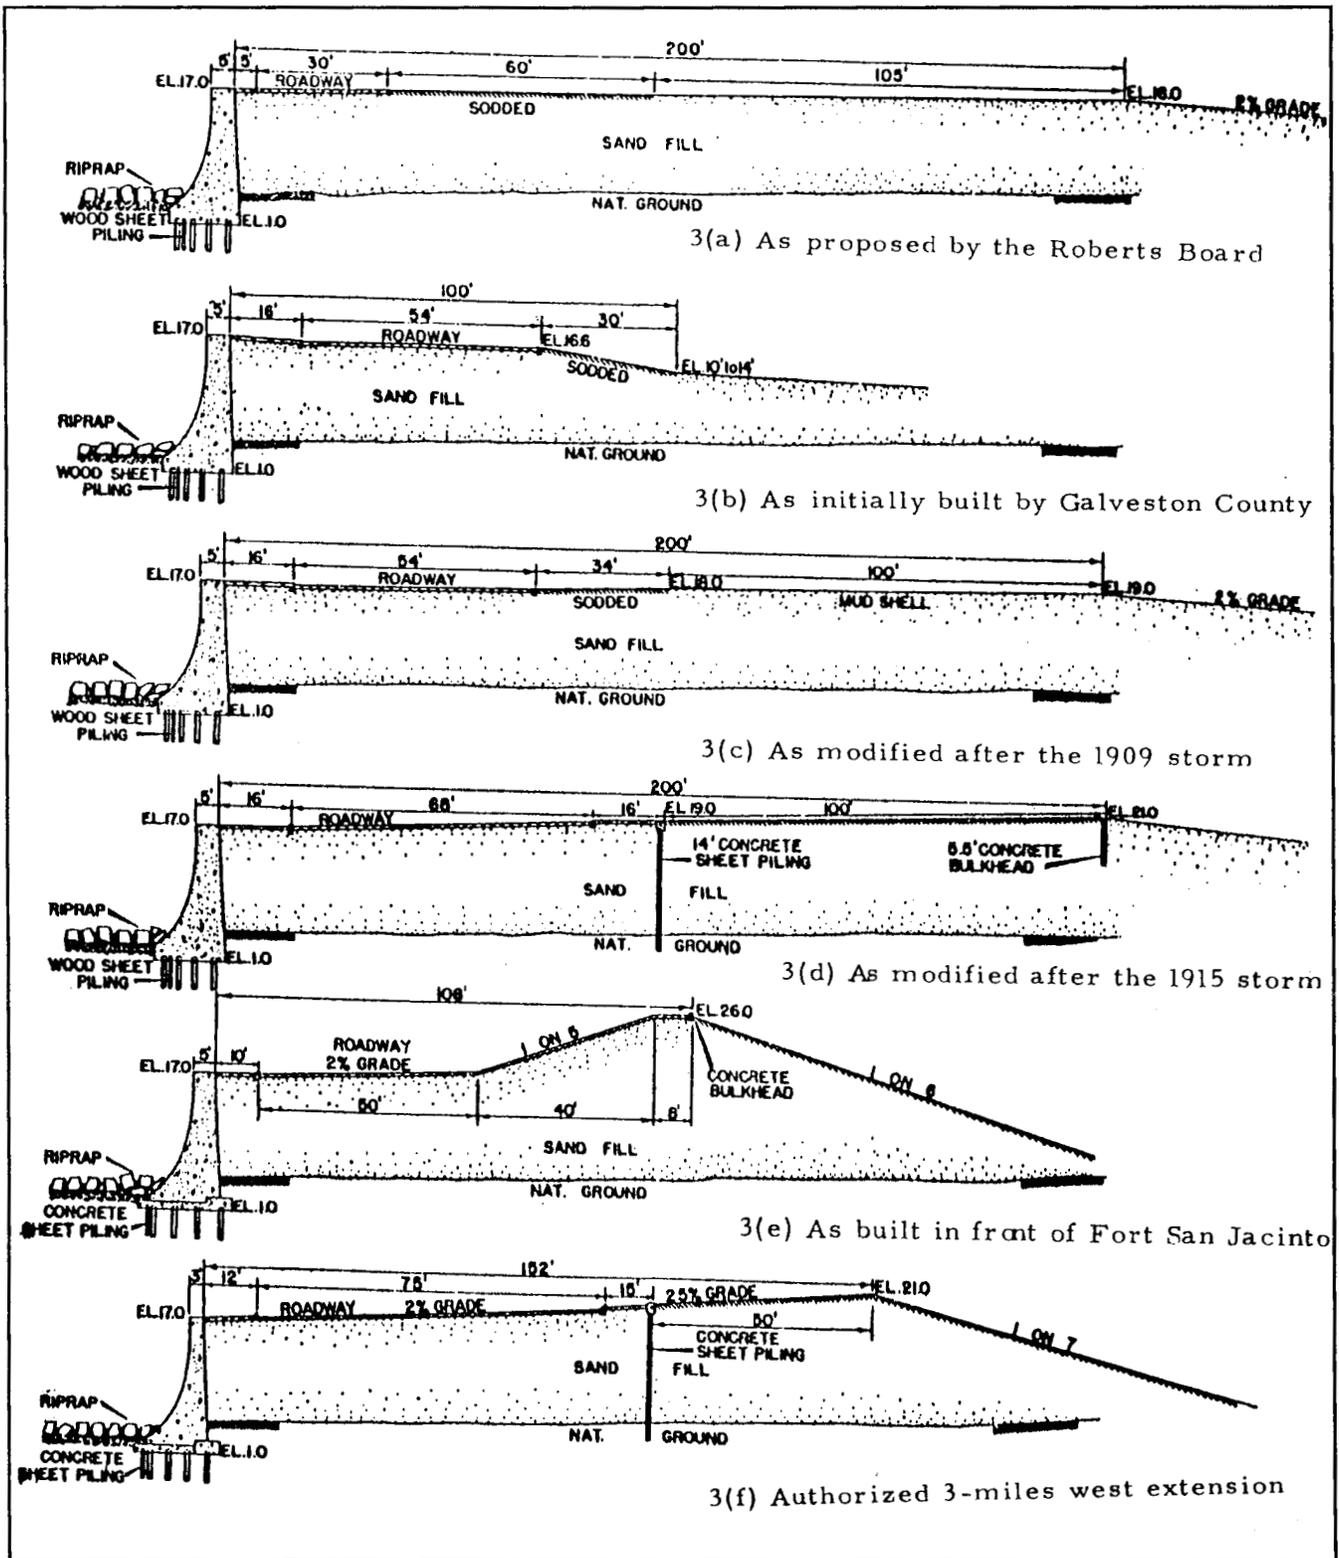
Cross-Sections of the Sea Wall and Embankment.¹¹
